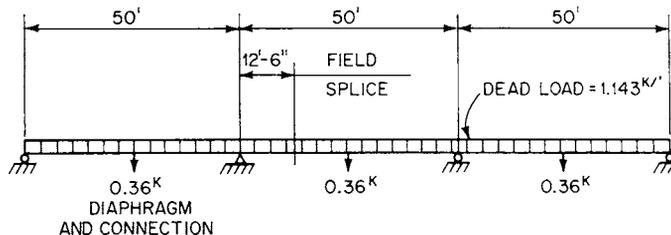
Stringers of Glenfield Bridge are continuous over three spans, with a splice in the center span. Dead load is classified as 0.941 kip/ft DC and 0.202 kip/ft DW .
